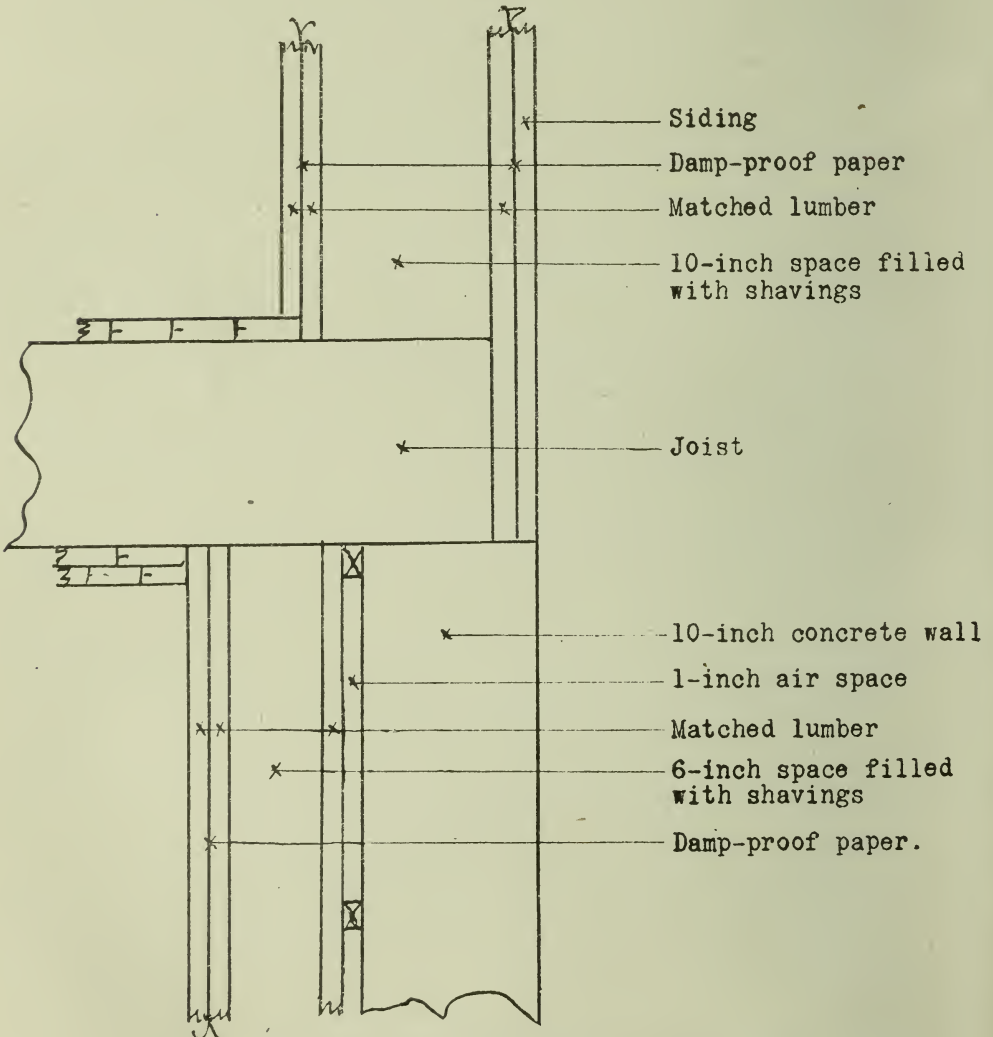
Section of wall at ceiling of basement of Cold Storage.
